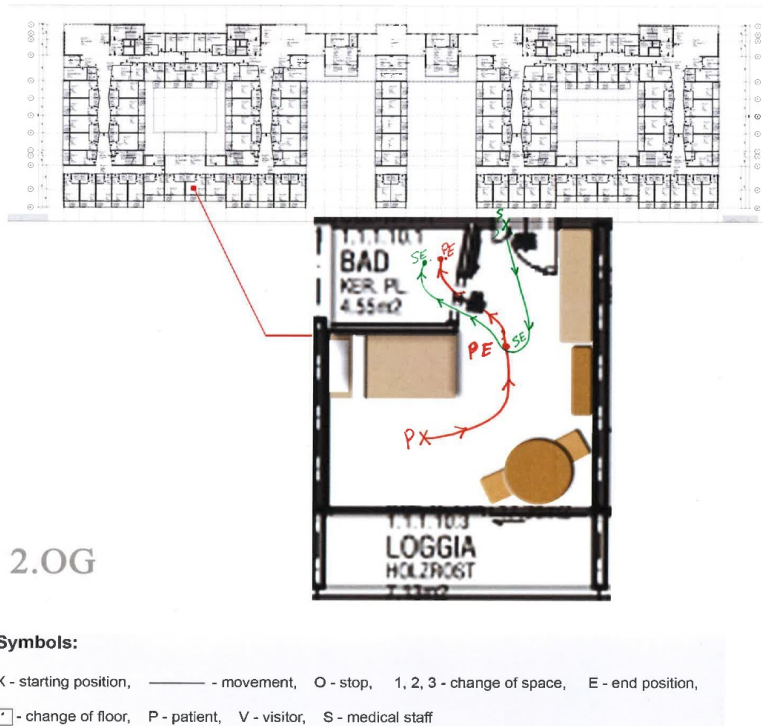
The point where the observed resident became disoriented in his room shown on the room's floor plan
